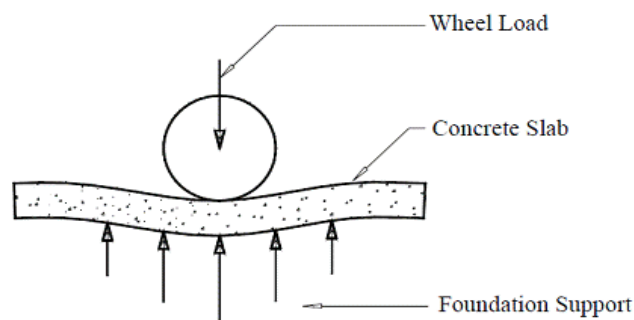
Transfer of wheel load to sub layer of pavement structure
